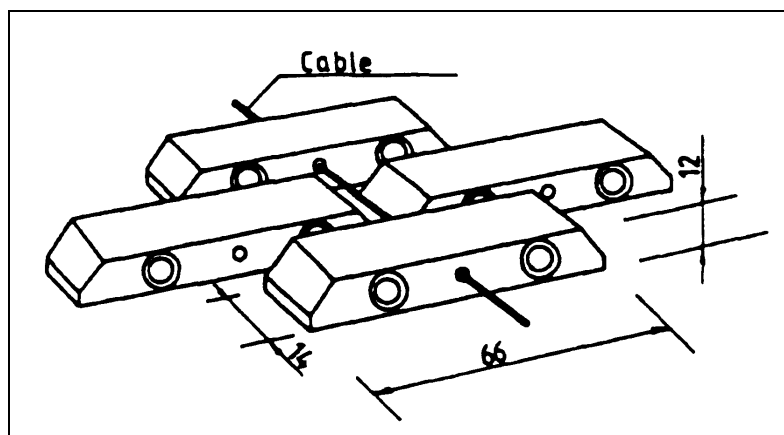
Cable-tied blocks used as bank protection (Przedwojski, et al., 1995)
